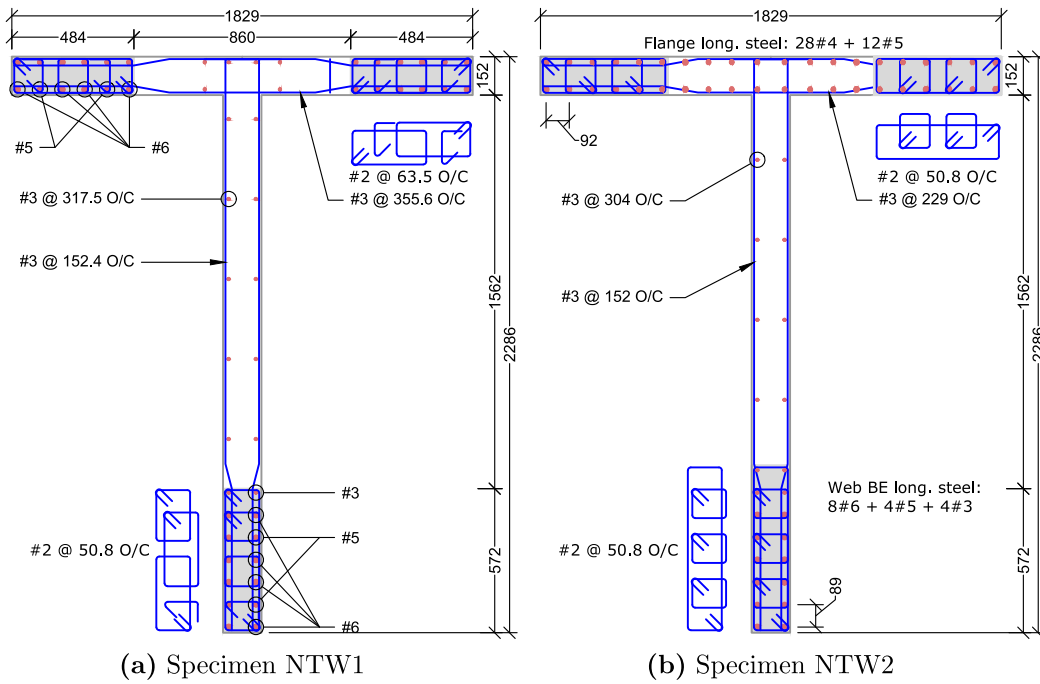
Cross-sectional details of the specimens tested by Brueggen et al. (bottom story, dimensions in mm).
